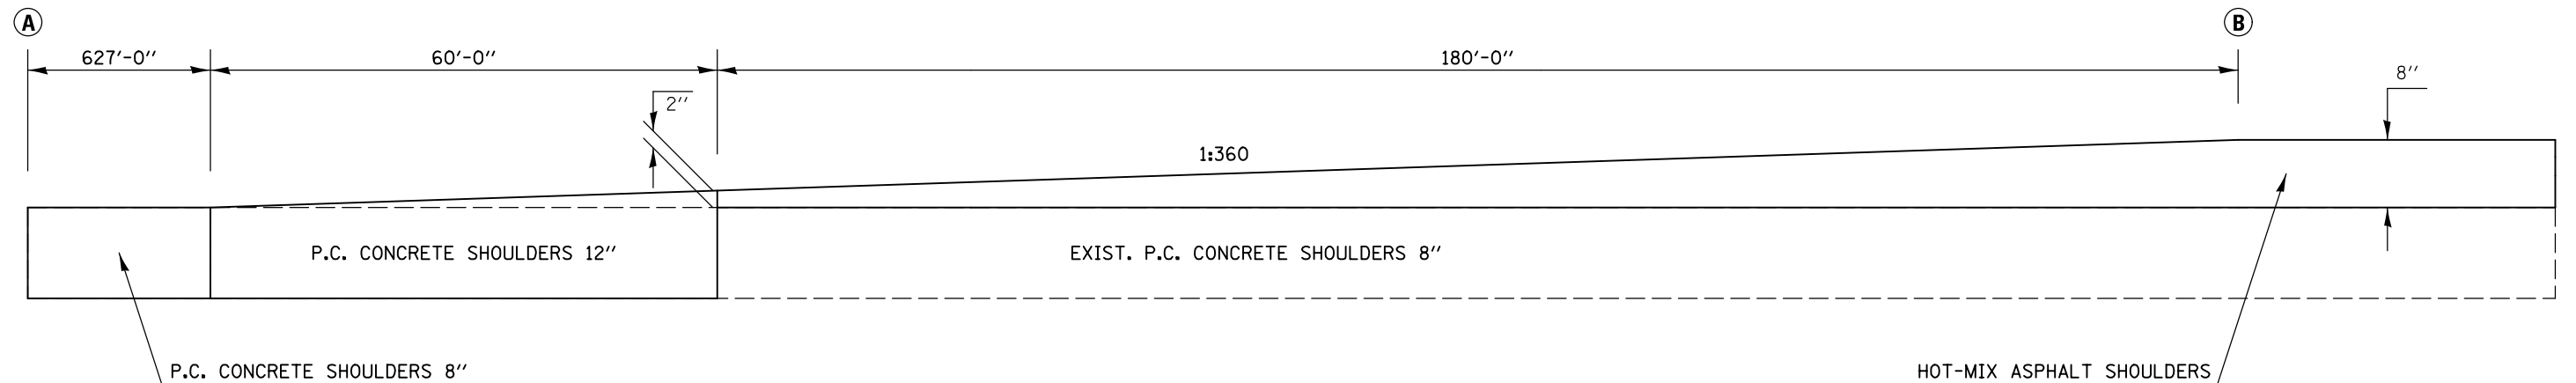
BUTT JOINTS AND PAVING TRANSITIONS
